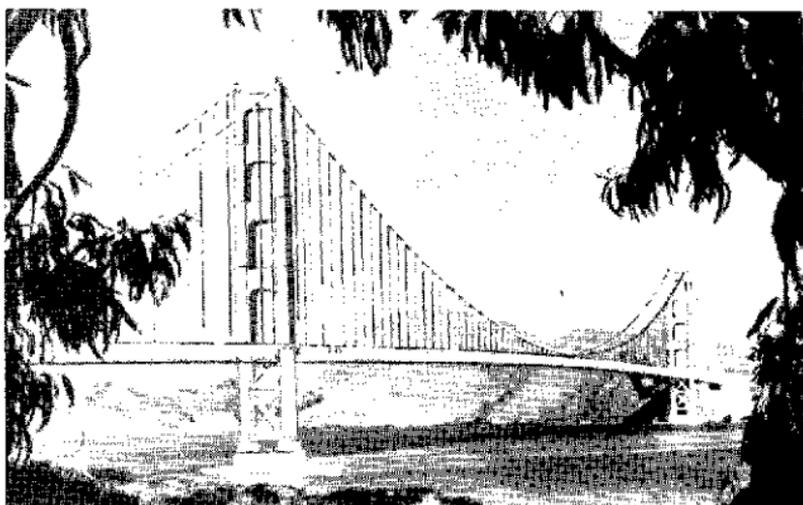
Suspension bridge with steel cable, steel reinforcing truss, steel floor beams, and external sway bracing.
